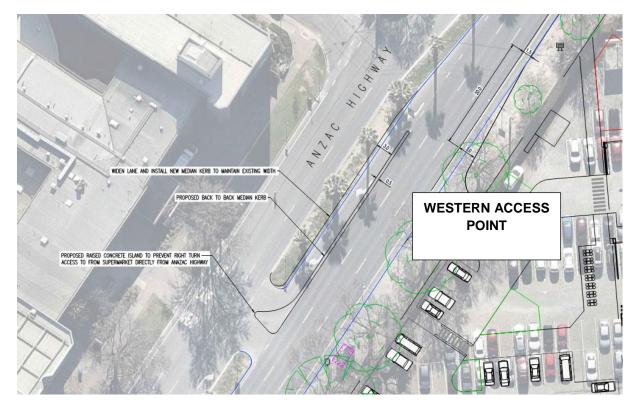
Proposed Modifications to Median adjacent Western Access Point
